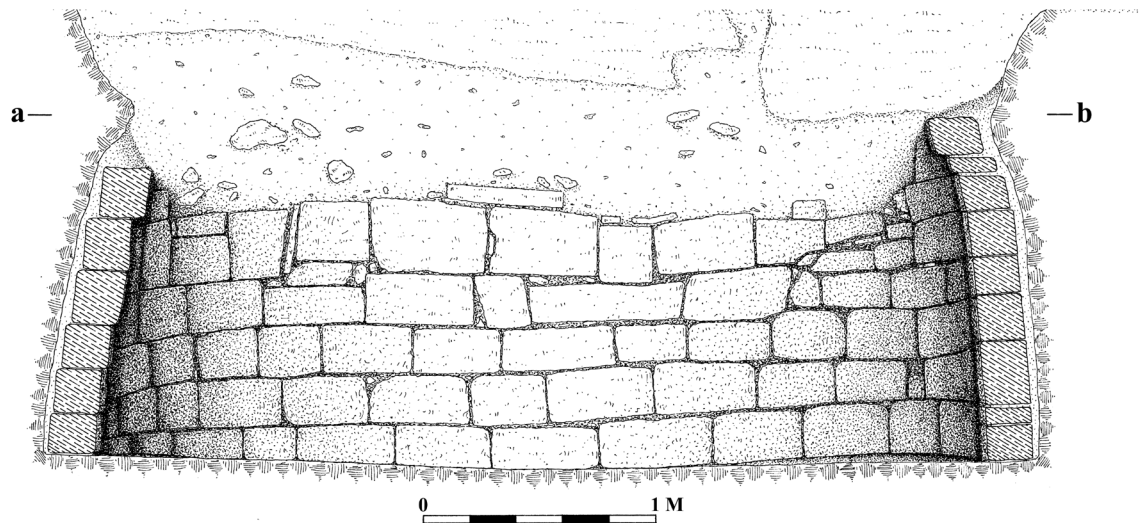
Survey section drawn with SW-NE orientation. Some irregularities in the placement of the facing rows are documented, and the parts of the facing shown in the section on the left and right have a different “slope” profile (drawing R. Simoncini; © Archivi SAlA, NIG 8601).
